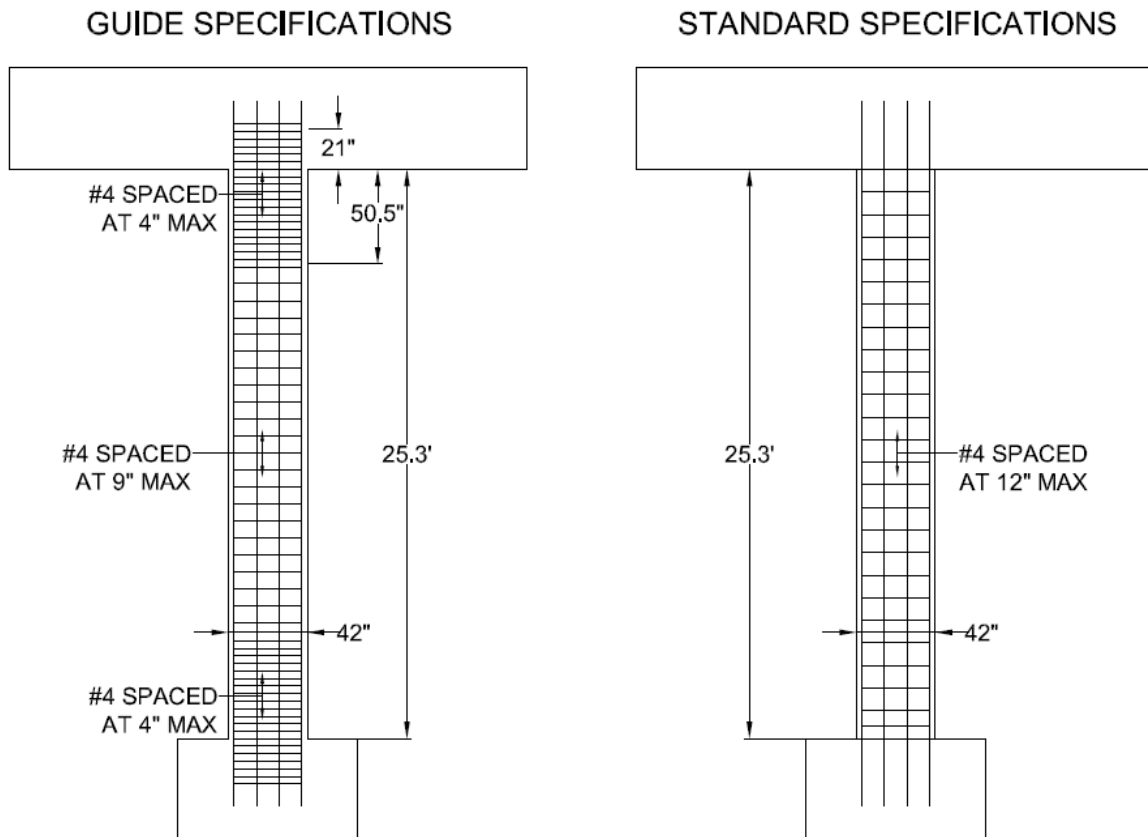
Bridge over Norfolk Southern Railroad Final Design Details (SDC B)
